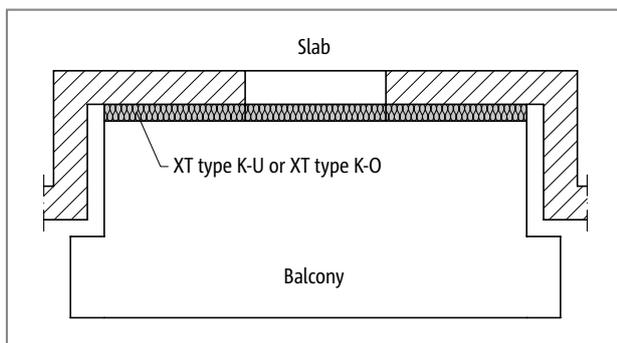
Schöck Isokorb® XT type K-U/K-O: Balcony with facade offset
